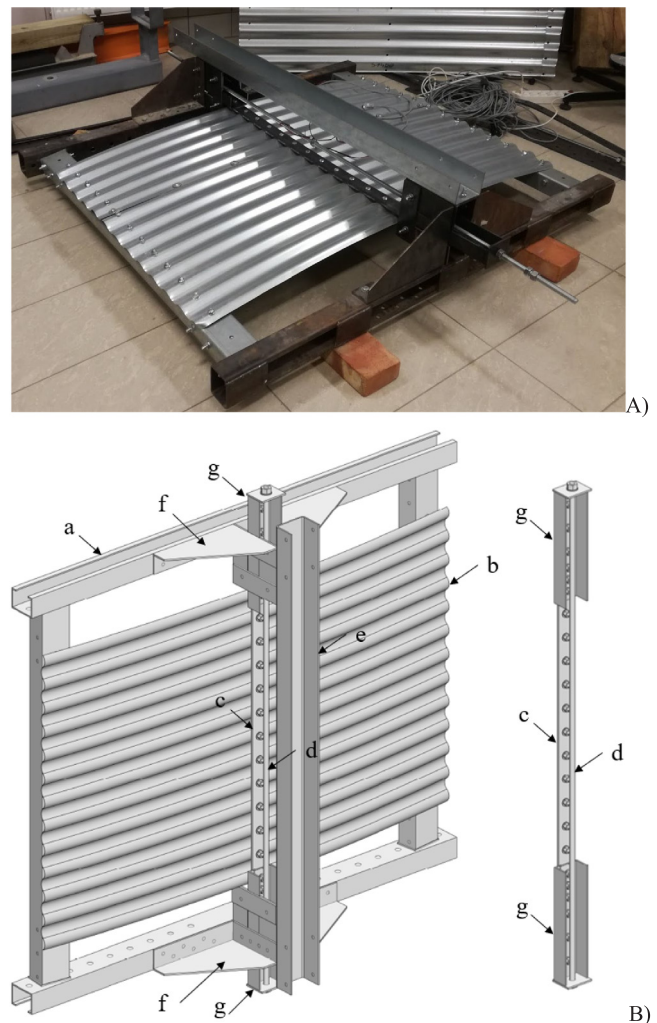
Test stand of silo column connected to corrugated sheet on laboratory scale ((A) view and (B) scheme): (a) steel frame, (b) corrugated sheet, (c) column-flat bar with cross-section of 50×6 mm², (d) steel tie-rod M16, (e) C-profile stiffening steel frame, (f) outermost rigid support nodes and (g) C-profile connecting flat bar with tie-rod.
